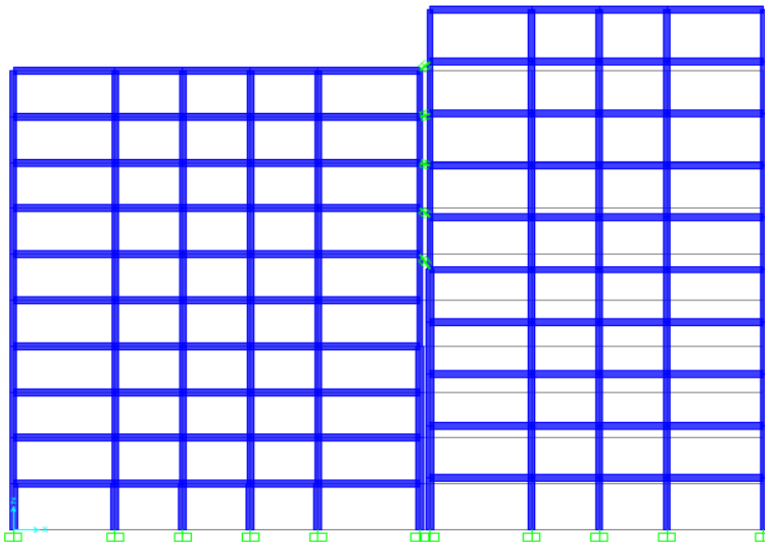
Elevation of structure, 3 m (left) and 3.2 m (Right) without FVD.
